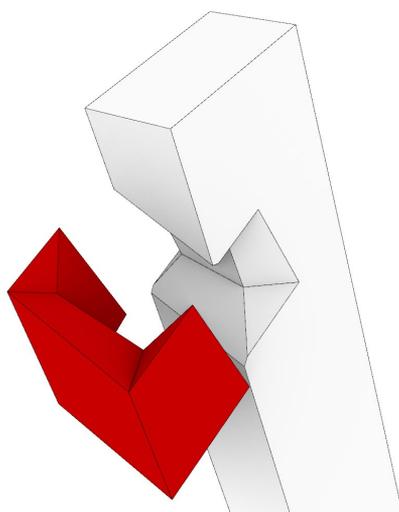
Boolean intersection to create detailing with cutting shape (in red) and resulting detail
